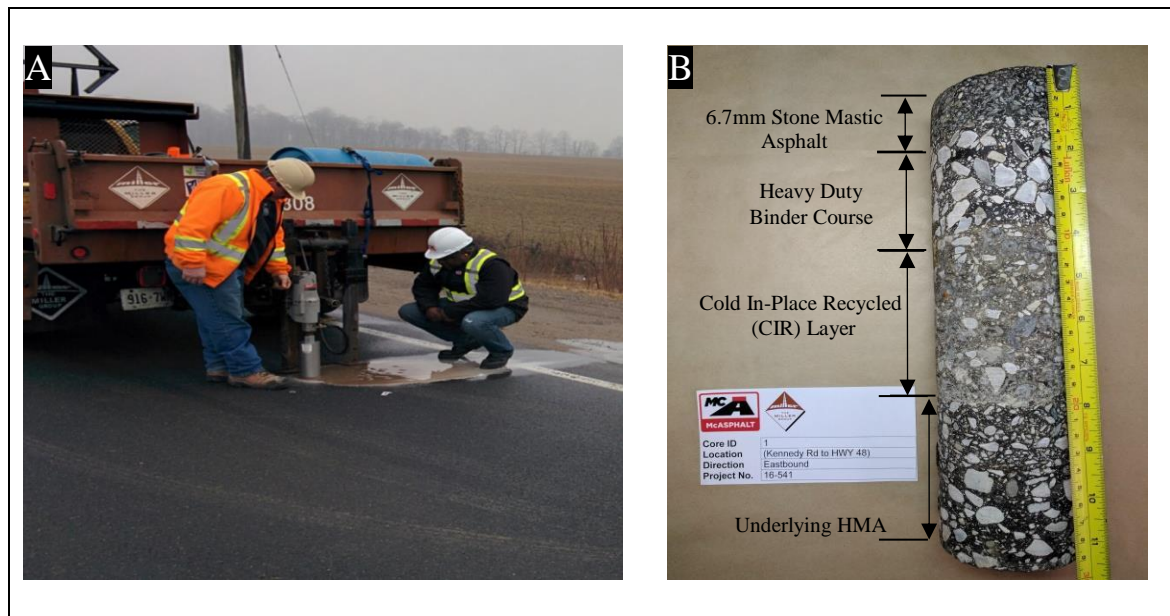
(A) Coring Operation for a 12-year Old Section of Bloomington Road (Highway 40) in Ontario, Located Between Kennedy Road and Highway 48, and (B) A Well-bound Core Extracted From Bloomington Road
